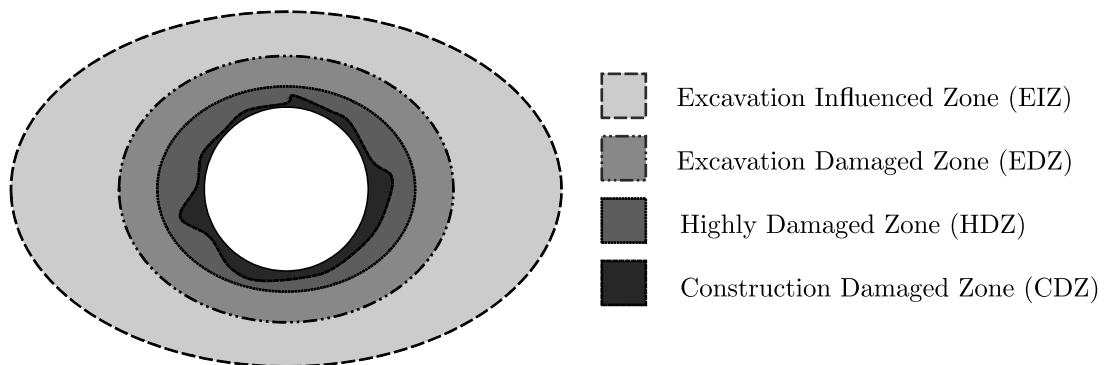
Various damaged zones around the excavation (Perras and Diederichs, 2016)
